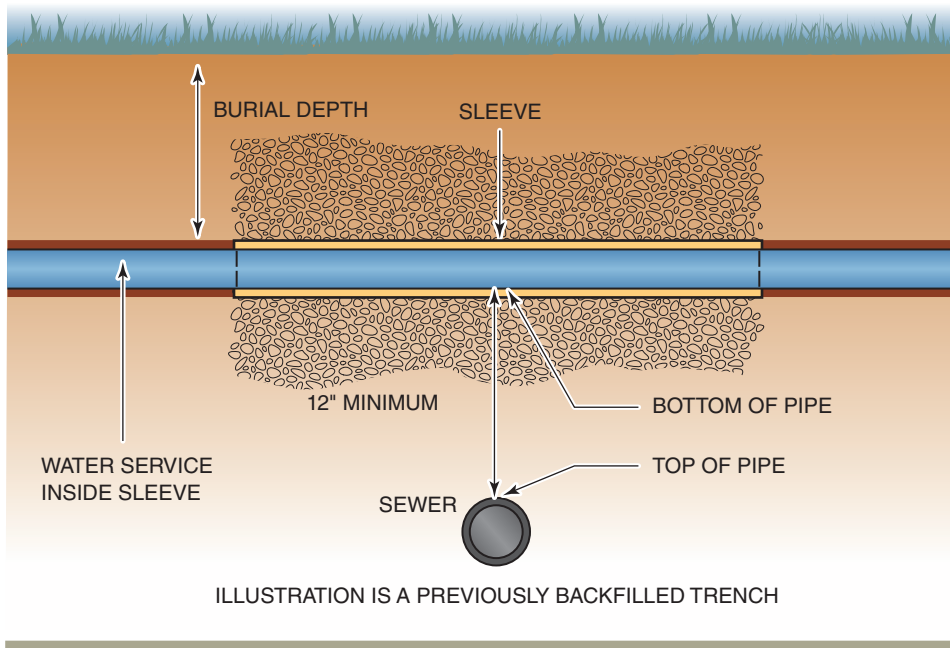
A water service must be installed in a sleeve when crossing a sewer trench.
